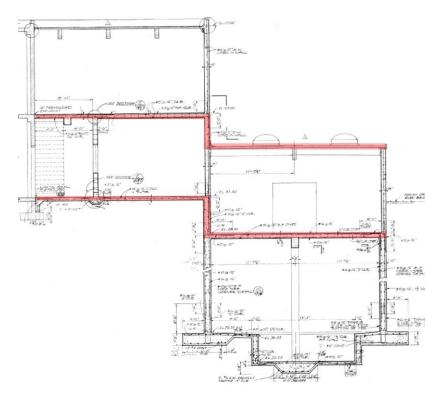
Split Level Diaphragms (Source Drawings: "Water Treatment Plant(A700004)")
